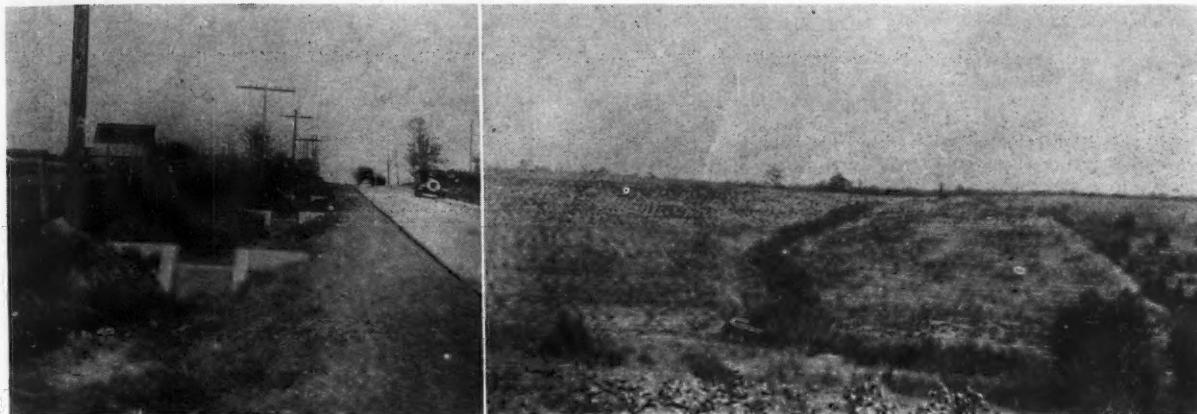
(Left) Series of reinforced concrete dams built to prevent erosion in roadside ditch. Fig. 8. (Right) Terrace outlet in draw, seeded to grass to prevent erosion
